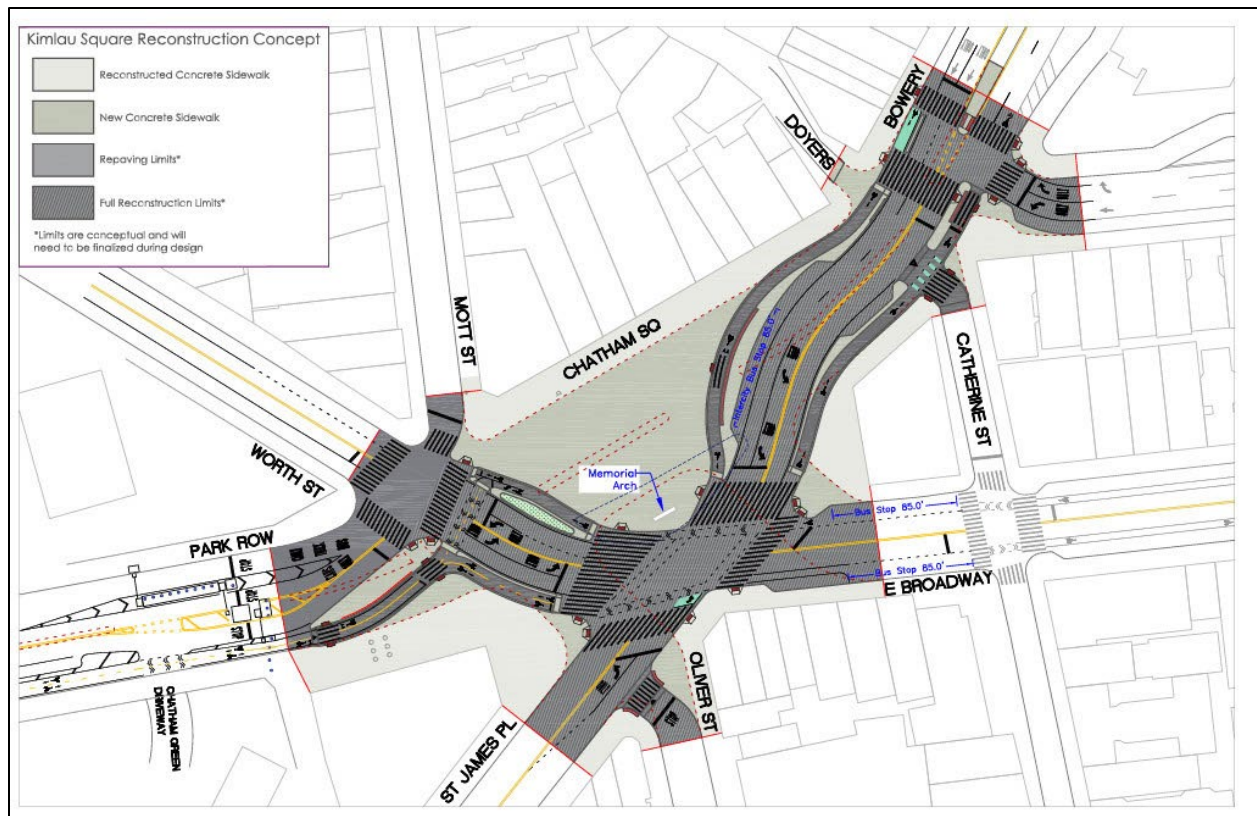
NYCDOT proposed plan (NYC EDC 2024).
